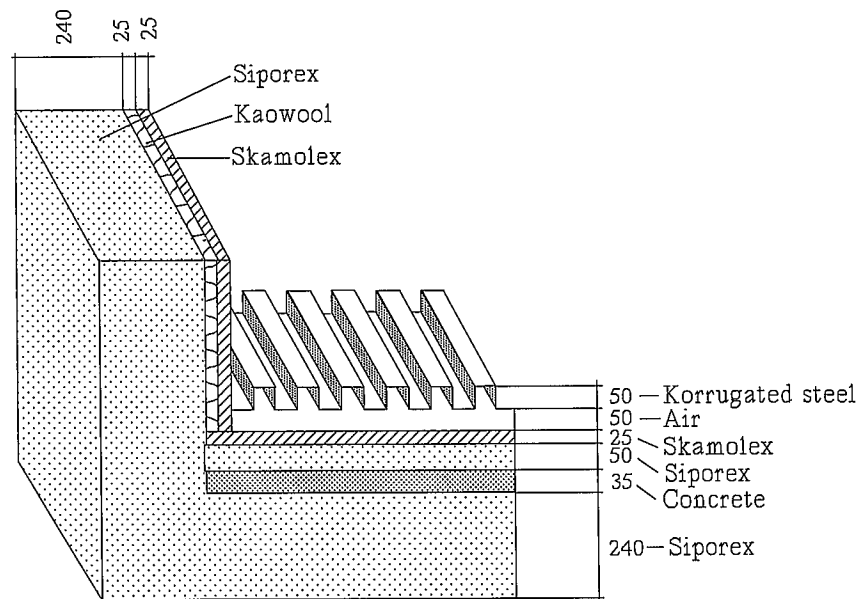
Cross-sectional view of the floor and walls of the test compartment. The ceiling is constructed similar to the wall. Dimensions in mm.
